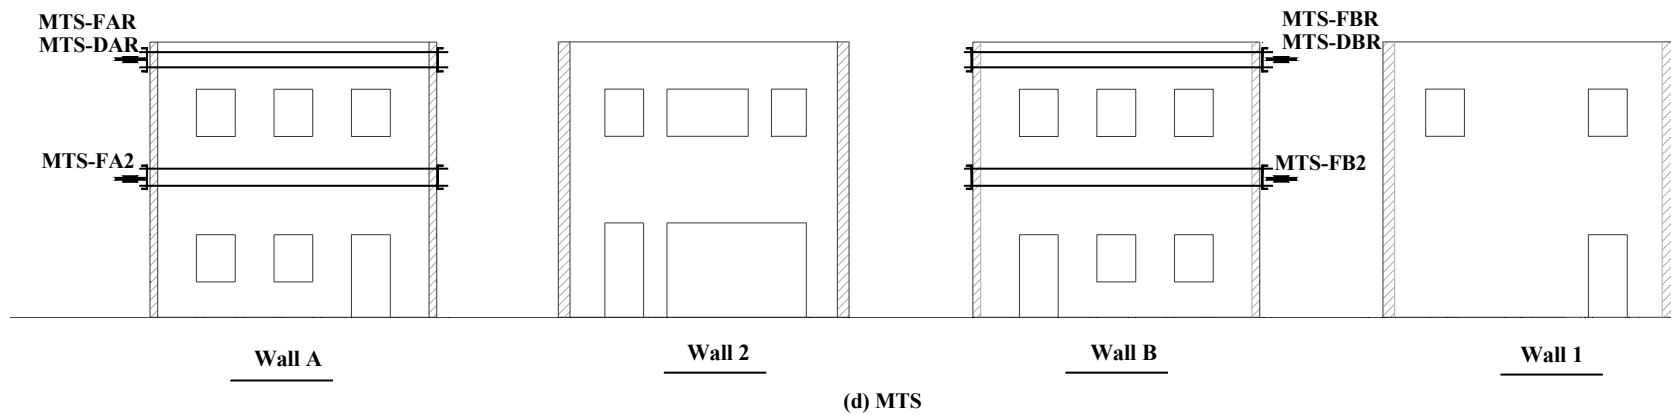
Instrumentation of the in-plane wall tests parallel to Walls A and B
